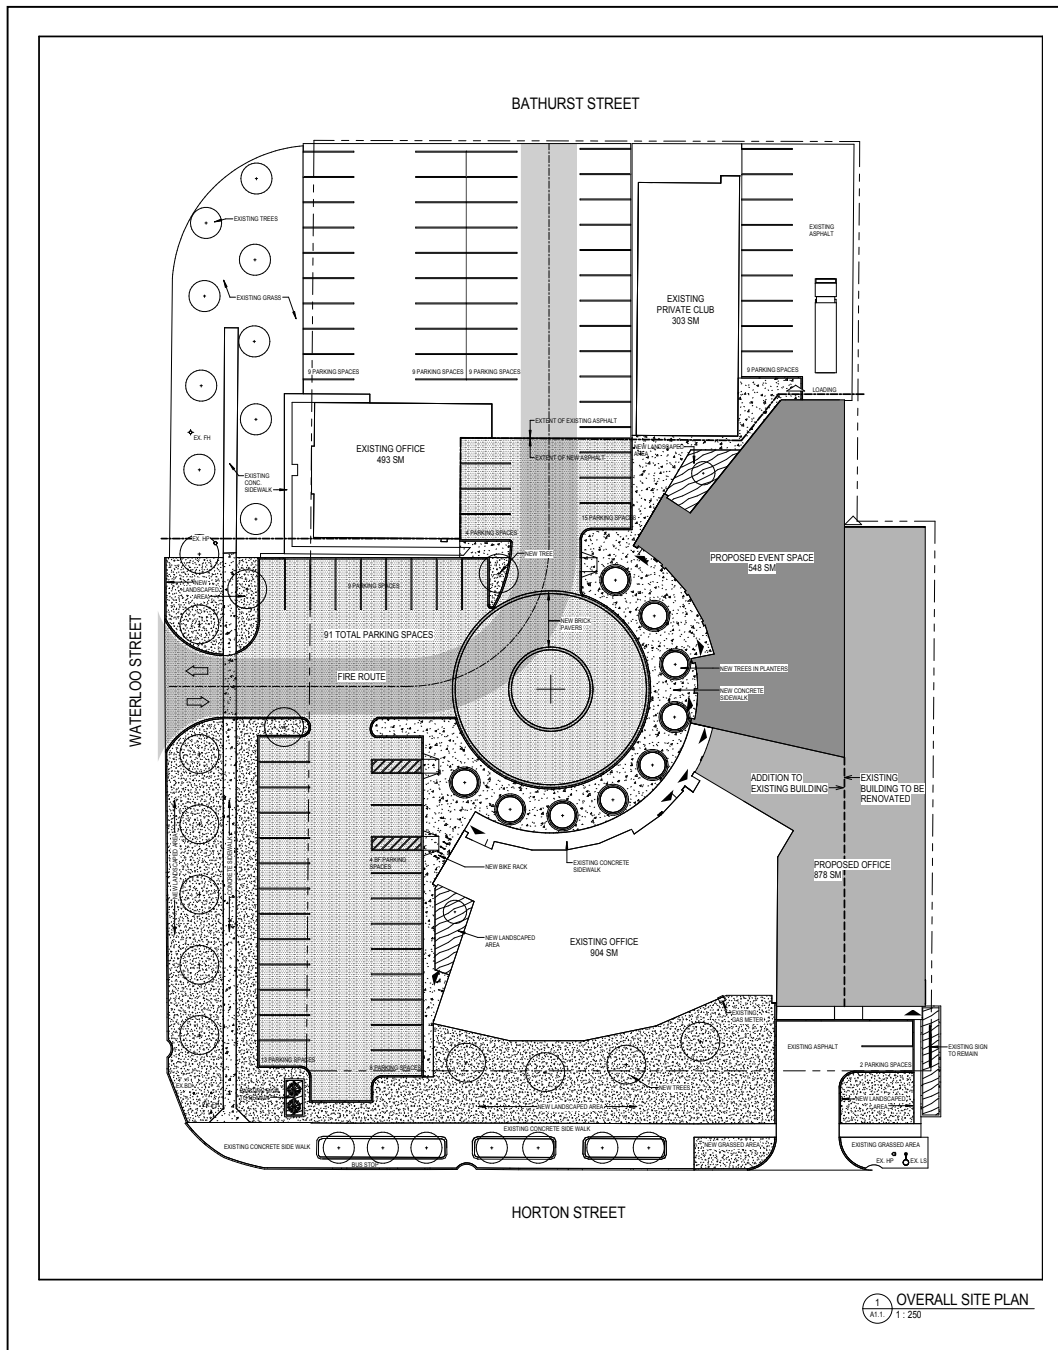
Site plan indicating Phase 1—existing Roundhouse—Phase 2 addition, landscape and parking concept (credit: Nicholson Sheffield Architects Inc.)
